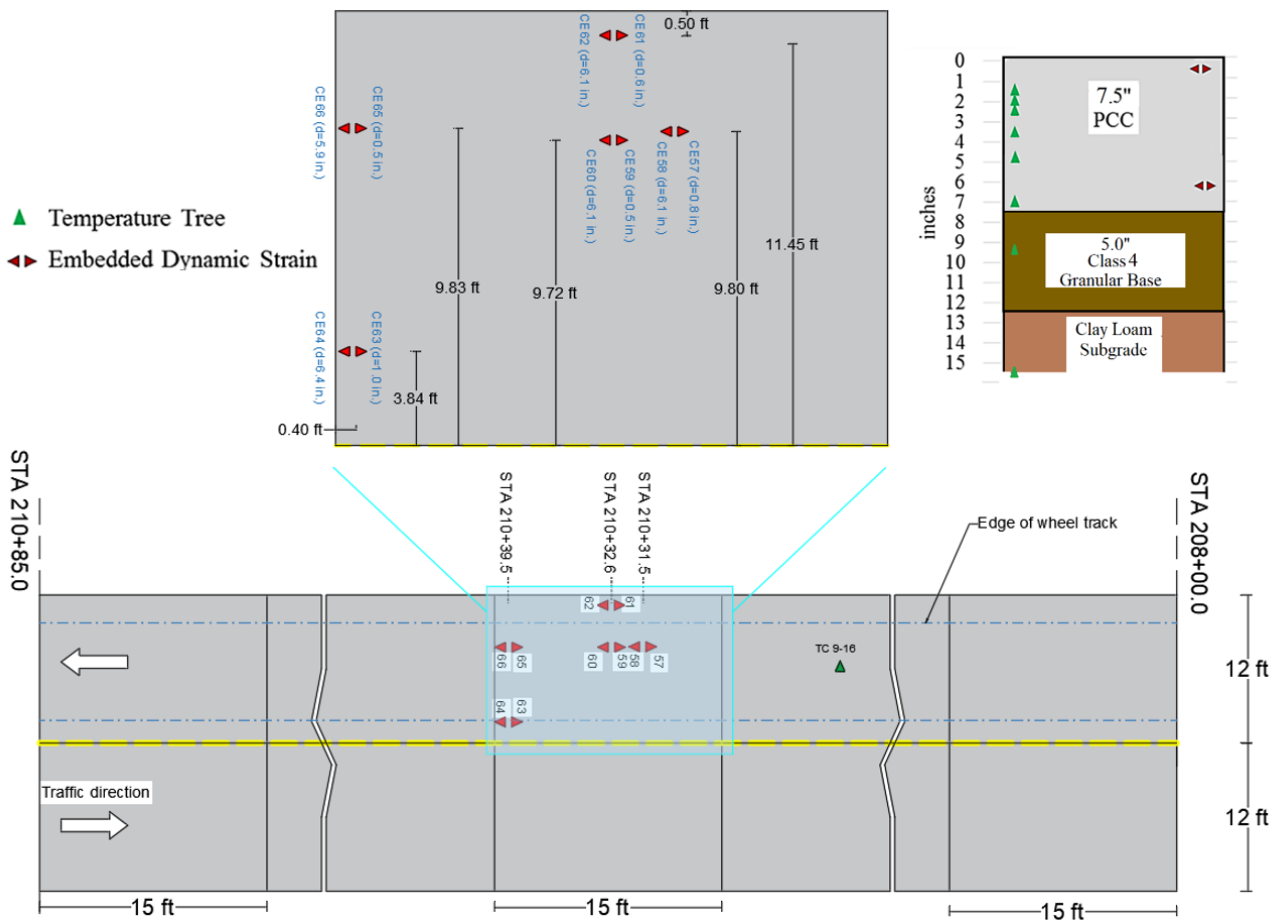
MnROAD Cell 52 Section and Sensor Layout
